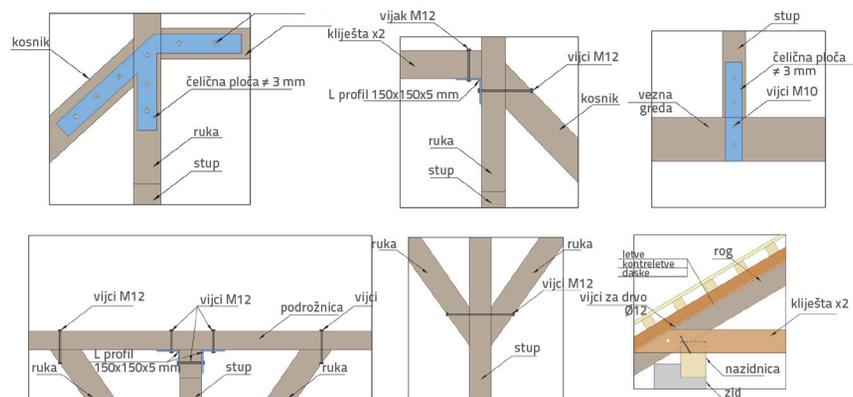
Details of reinforcement of existing wooden roof structure [12]
